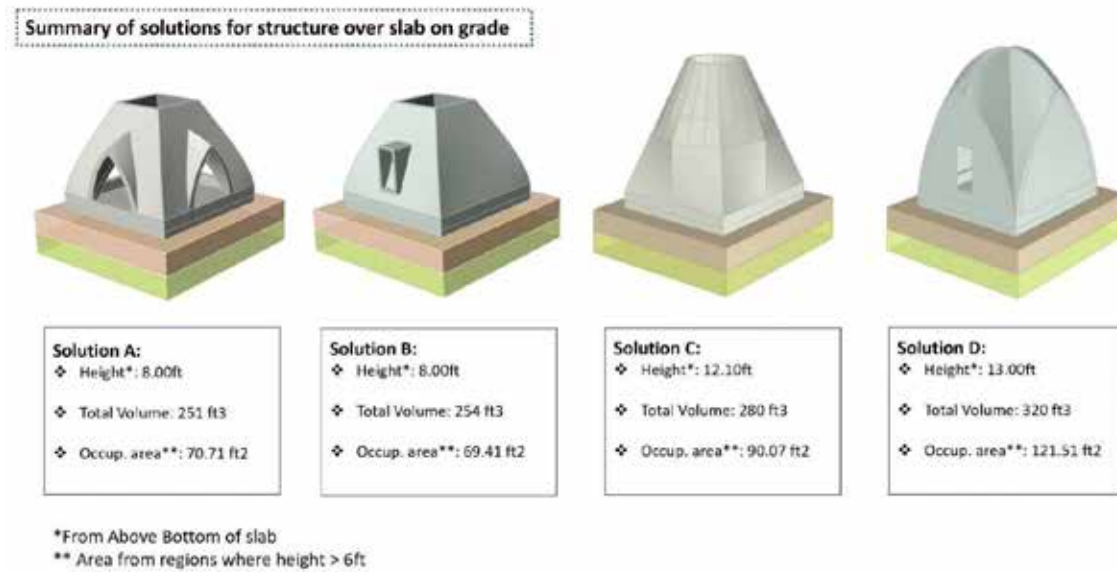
Selection of structures with vaulted roof structures for further study: slab on grade version with foundation consisting of floating slab supported directly over the active layer.
